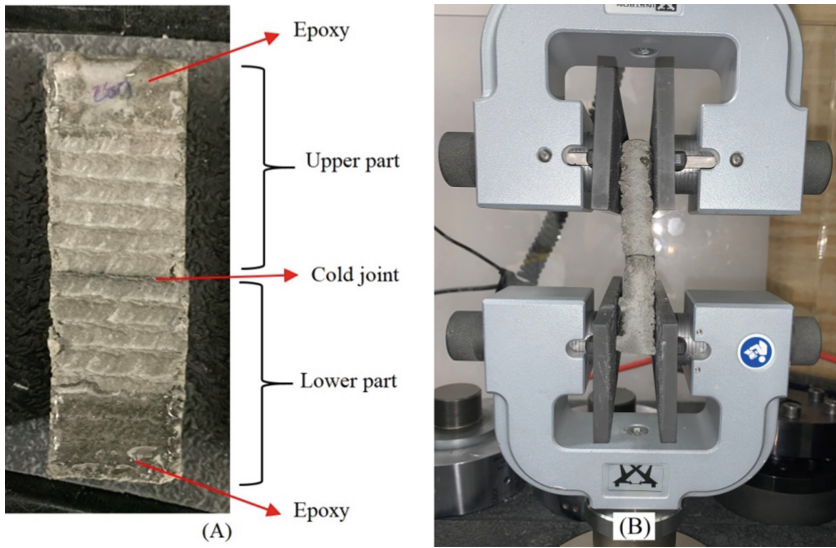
(A) Interlayer adhesion test specimen; (B) Interlayer tensile adhesion test setup
